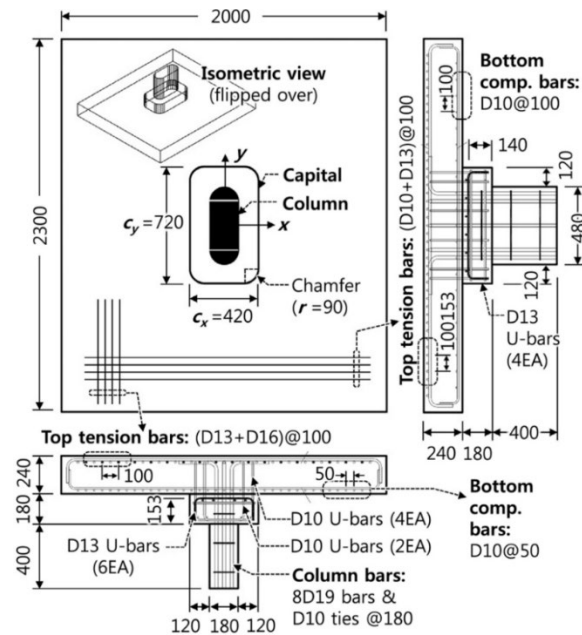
Typical geometry and reinforcement details of test slabs [26]
